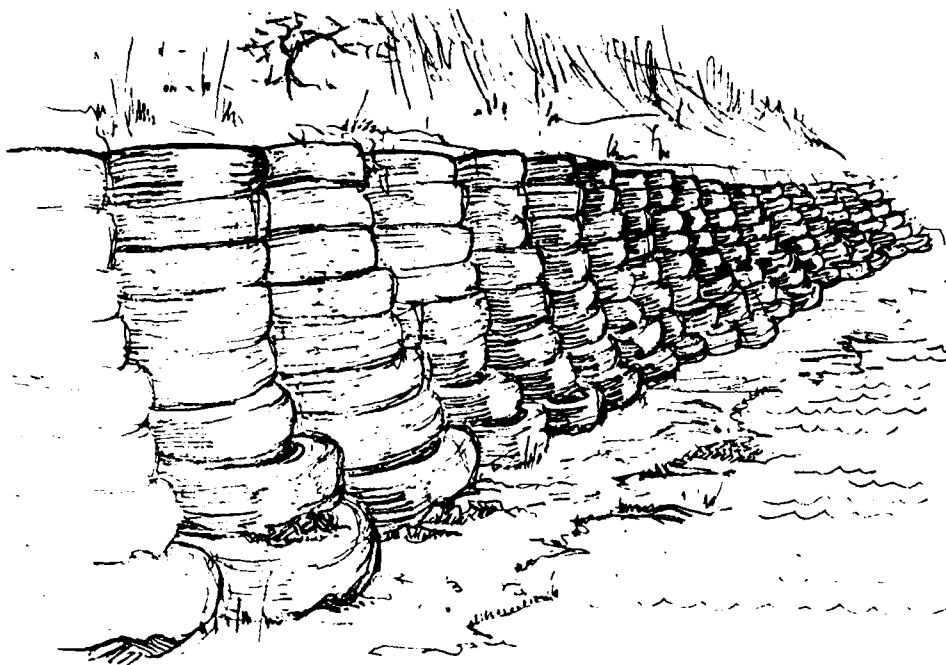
Used tire wall (bulkhead) built at the Moundsville, West Virginia (Grave Creek), demonstration project
